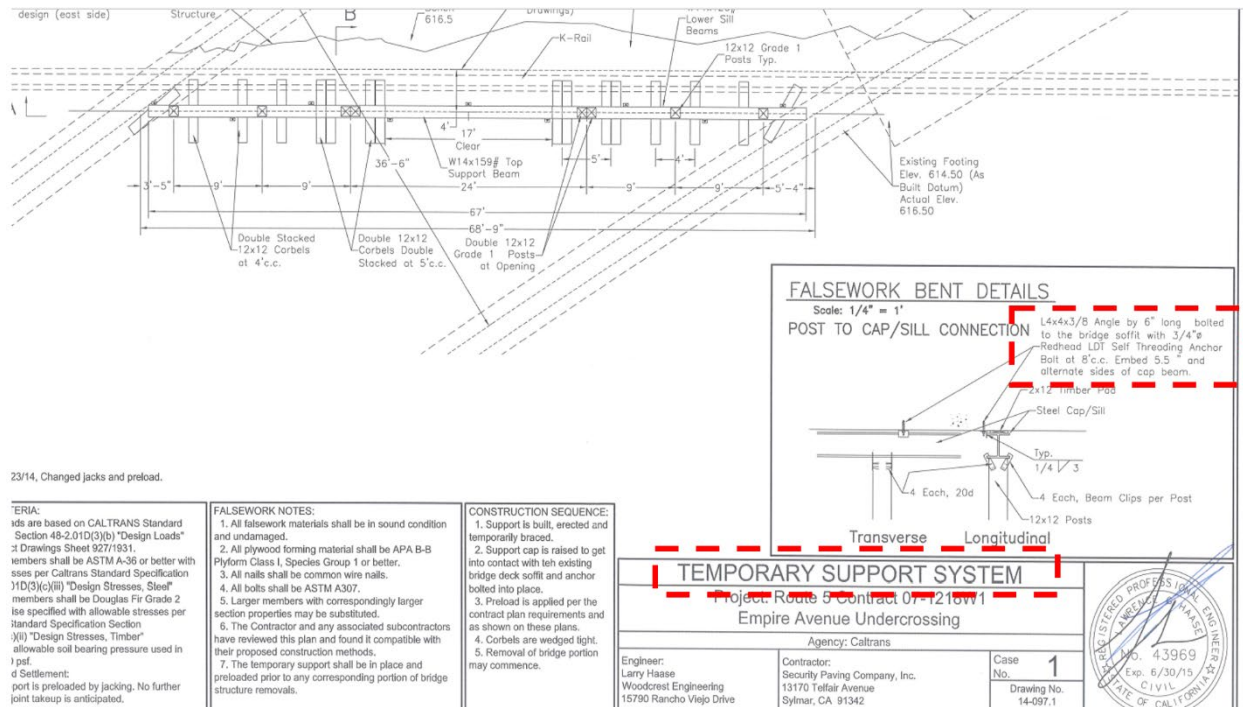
Expansion Anchor Bolt Used to Attach Temporary Support to an Existing Structure
